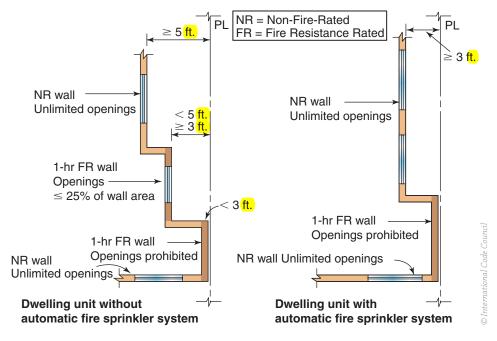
Fire resistance of exterior walls adjacent to lot lines
